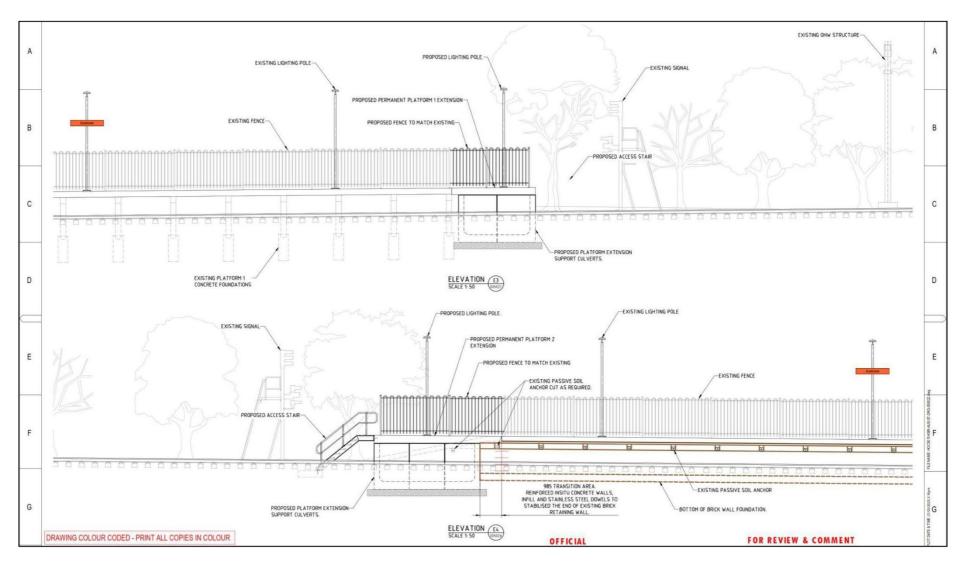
Elevations plan of proposed Austinmer Station platform extensions (Source: Transport for Tomorrow 2025)
